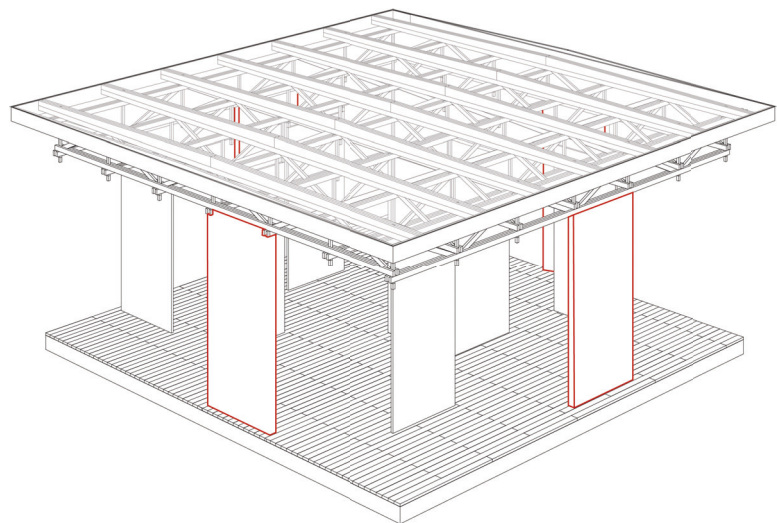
Structural walls highlighted in red, with remaining walls as part of flexible public framework.
